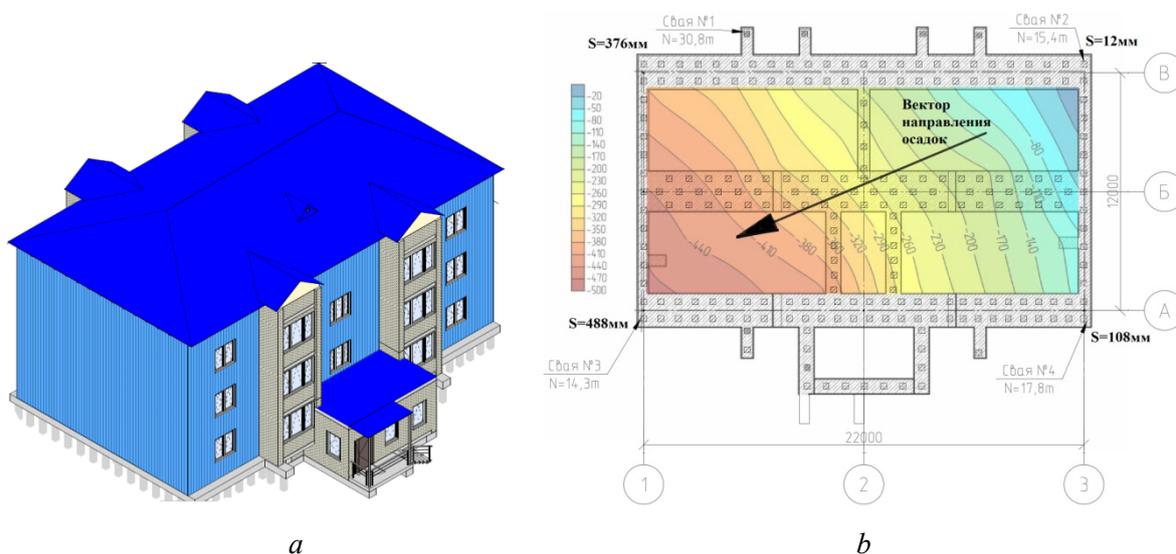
Object diagram: general view of the building (a), schematic plan with the pile loads and the direction of building slope (b)
